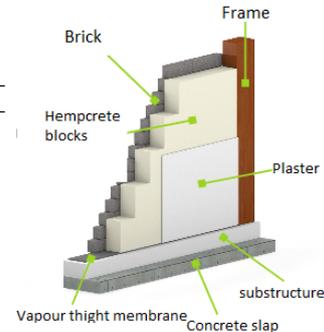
Properties of hempcrete blocks and a wall construction
